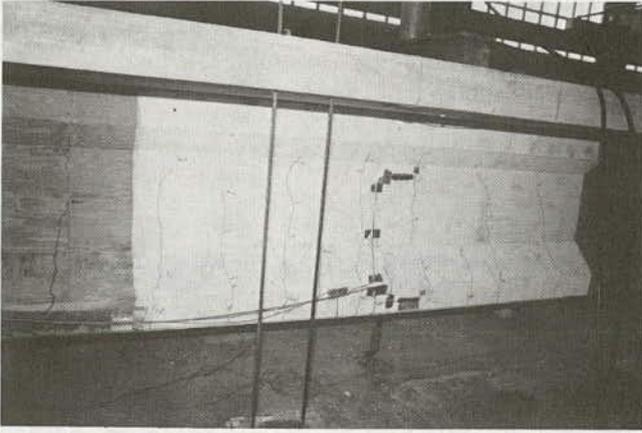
(a). Girder during load tests—girder cracks from first load test.
